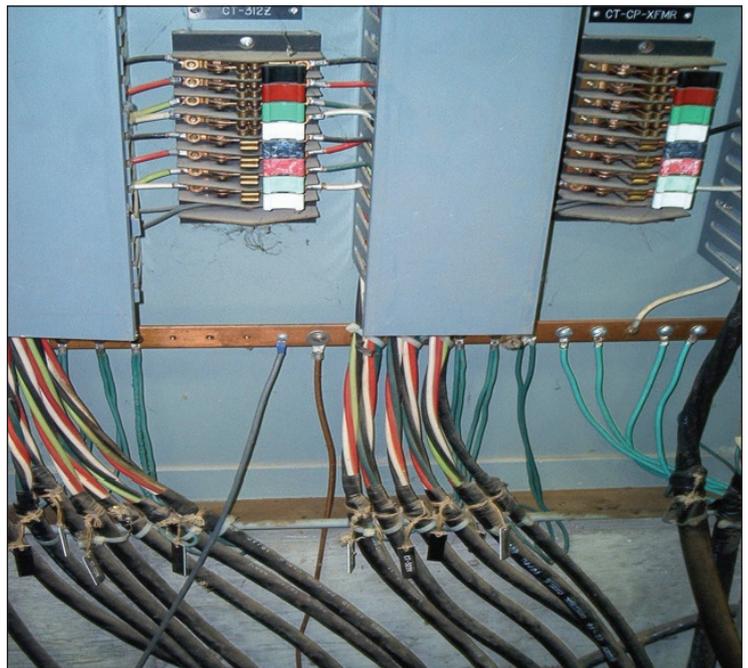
Typical cable grounding and junction box connections inside of a control house.
